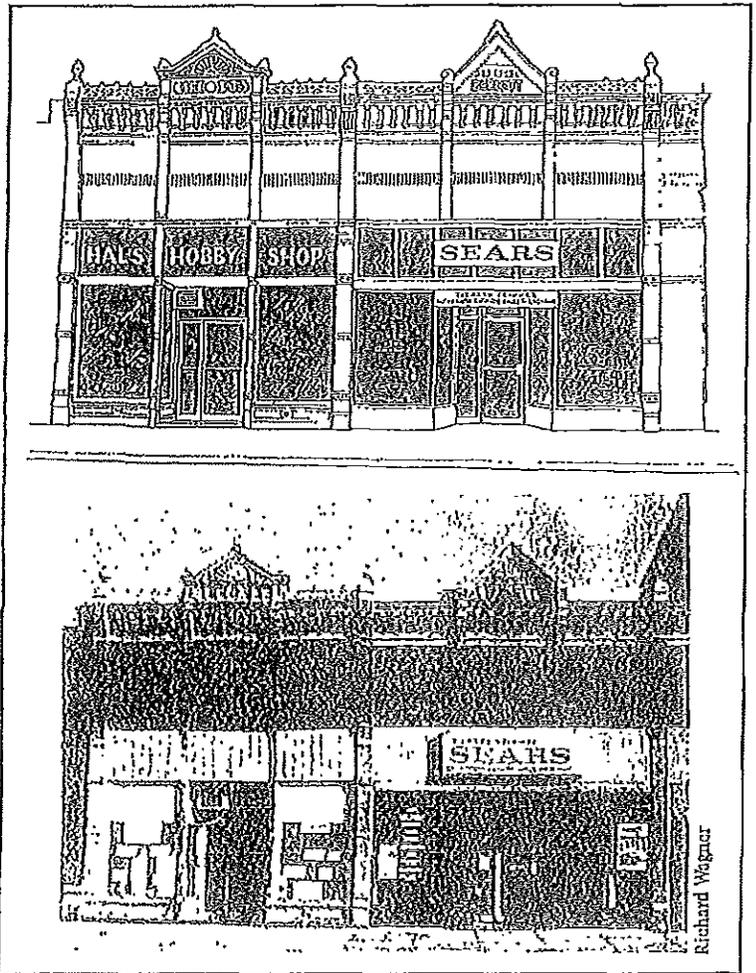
When a business expands into one or more adjoining buildings, the owner will often hang a sign that spans them all. Such an oversized sign visually cuts buildings in half and diminishes the distinctive architectural features that differentiate them. As the drawing below illustrates, one solution is to install two smaller signs that expose the building piers, restoring proper verticality and scale in both facades.
